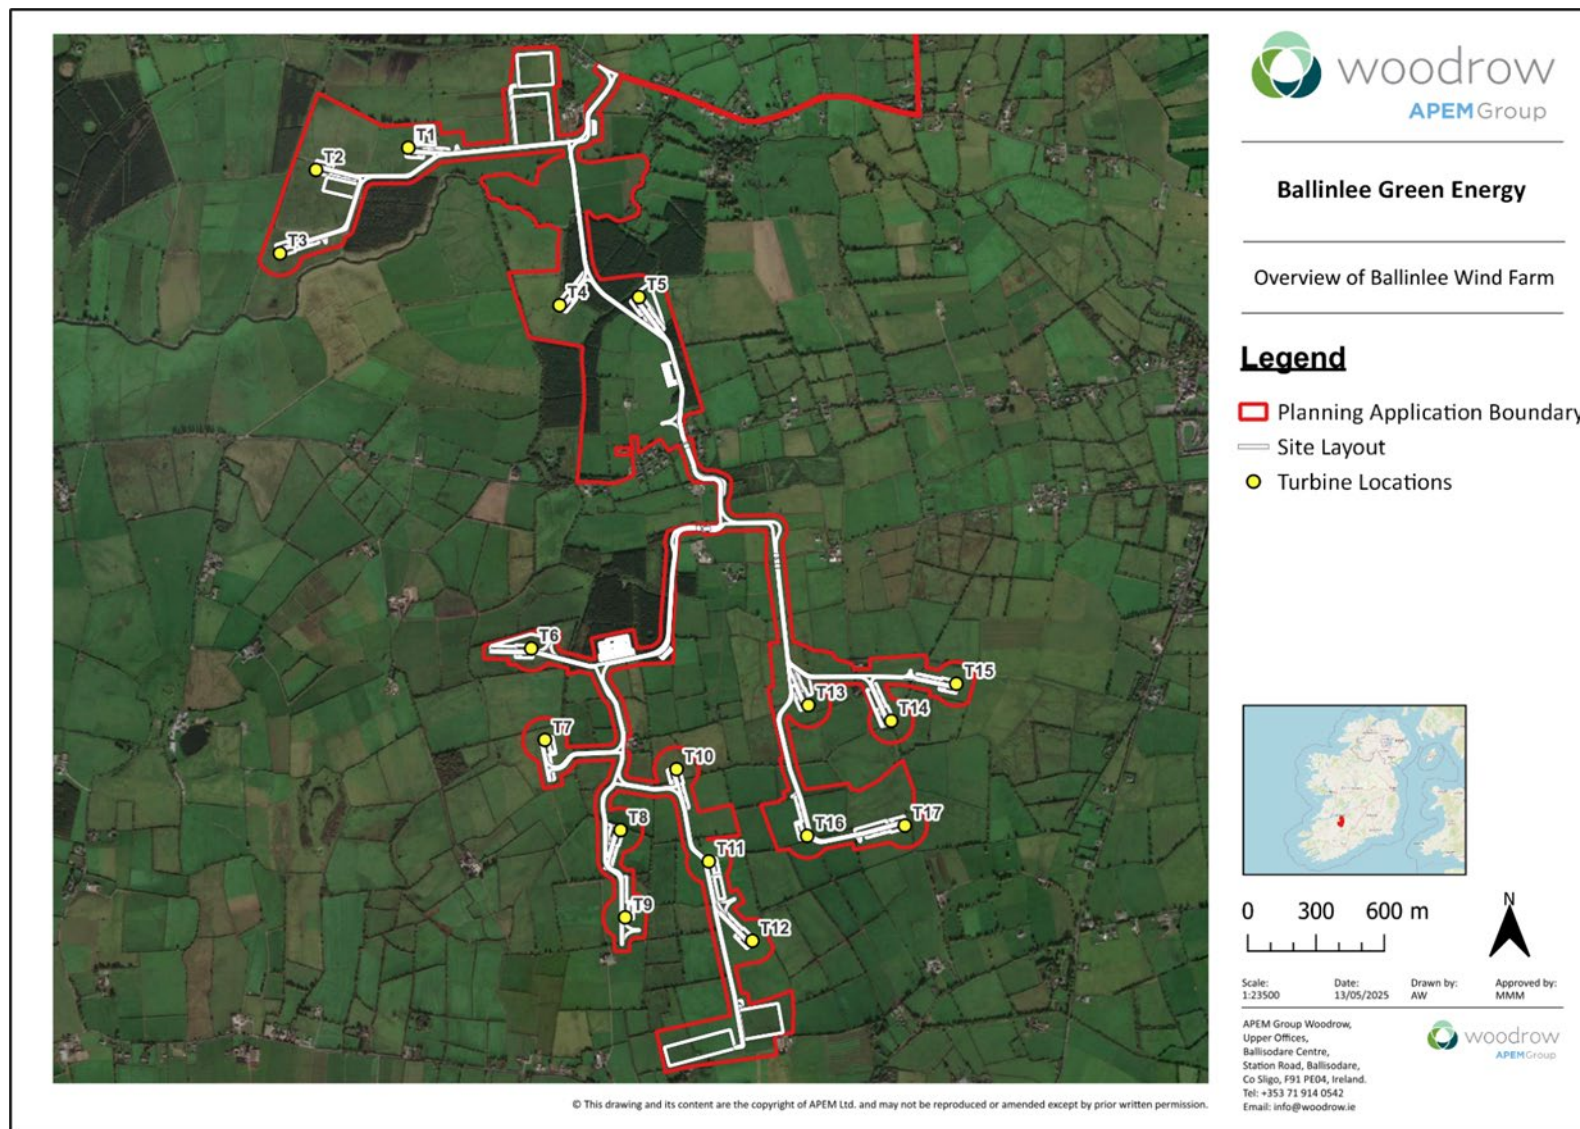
Overview of the Proposed Development showing the Planning Application Boundary and site layout
